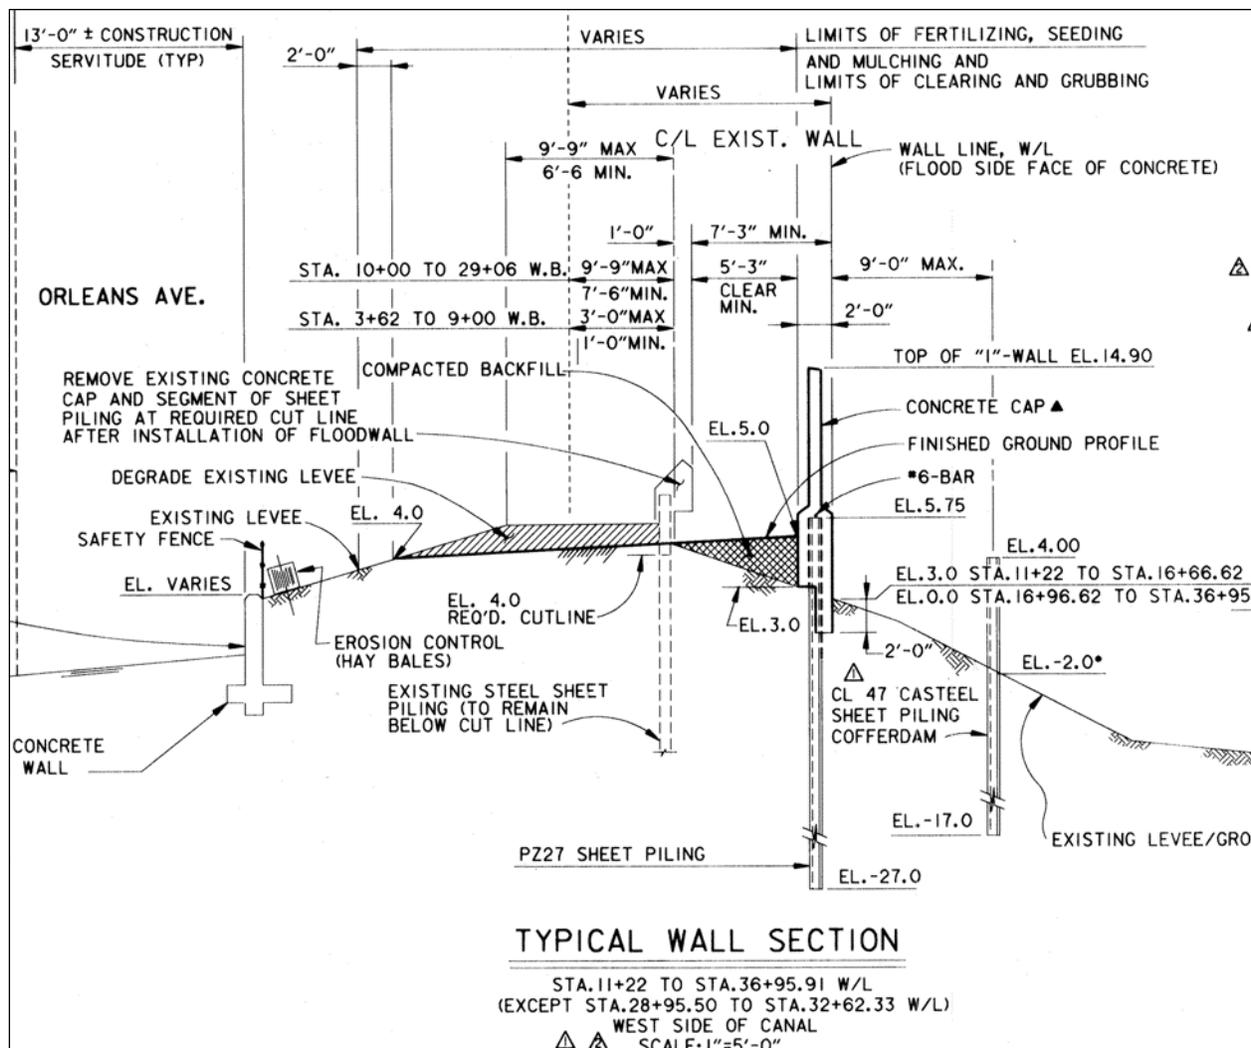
Typical I-wall section at elevation 14.90 ft (DACW29-93-C-0077).
